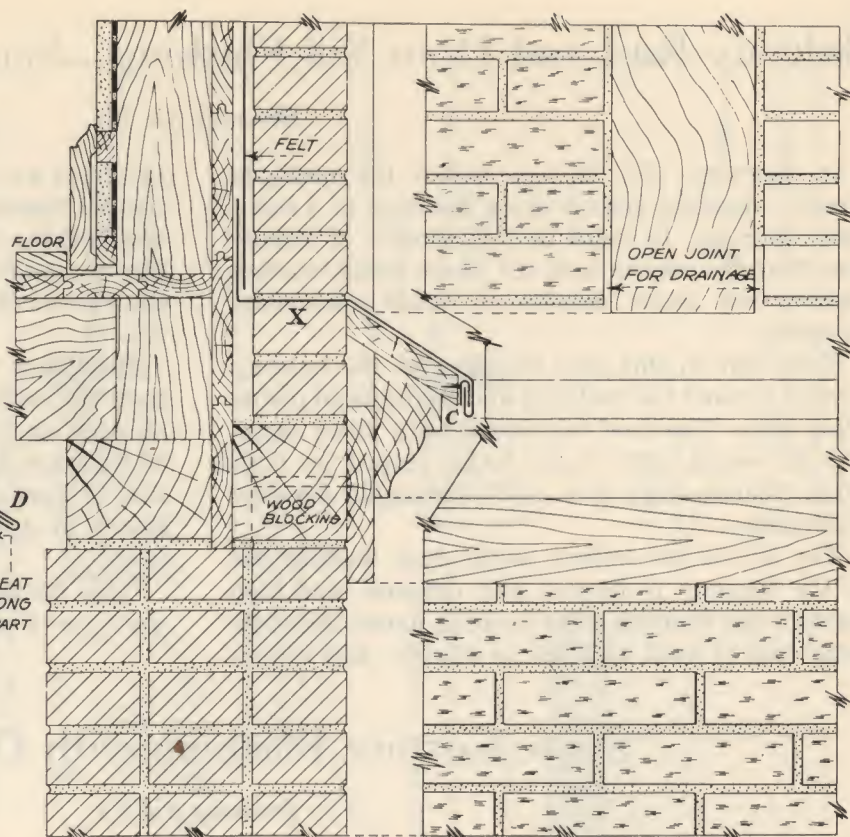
FLASHING WATER TABLE ON BRICK VENEER WALL - SCALE $1\frac{1}{2}" = 1'-0"$
